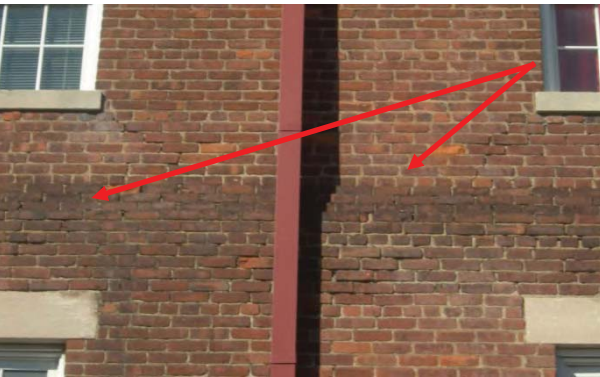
East elevation @ old canopy. Patch bolt holes & reglet to prevent water intrusion
